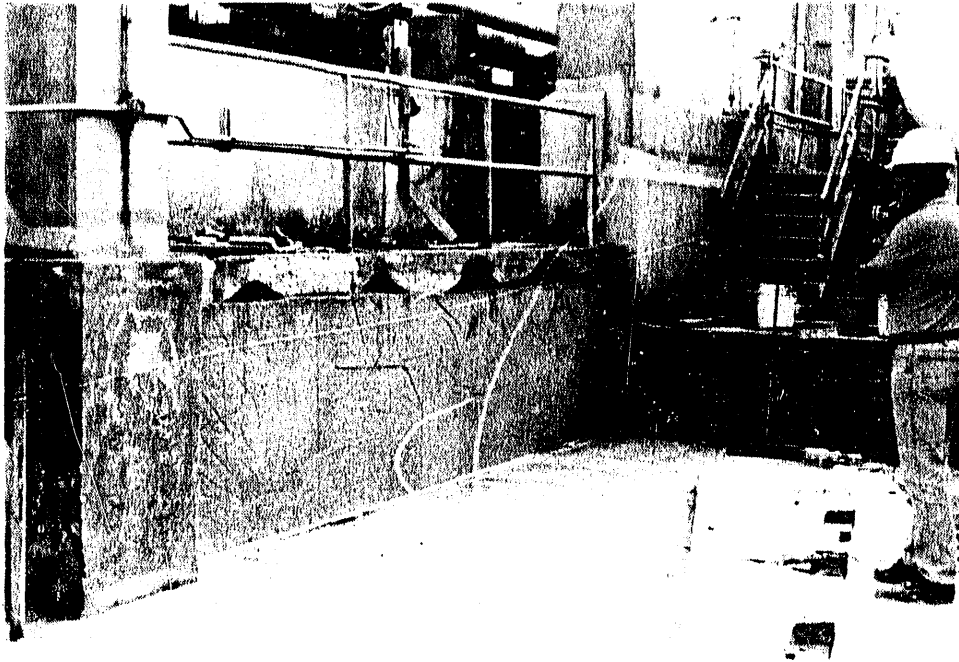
Section of sump floor and wall after placement of insulating overlay.
